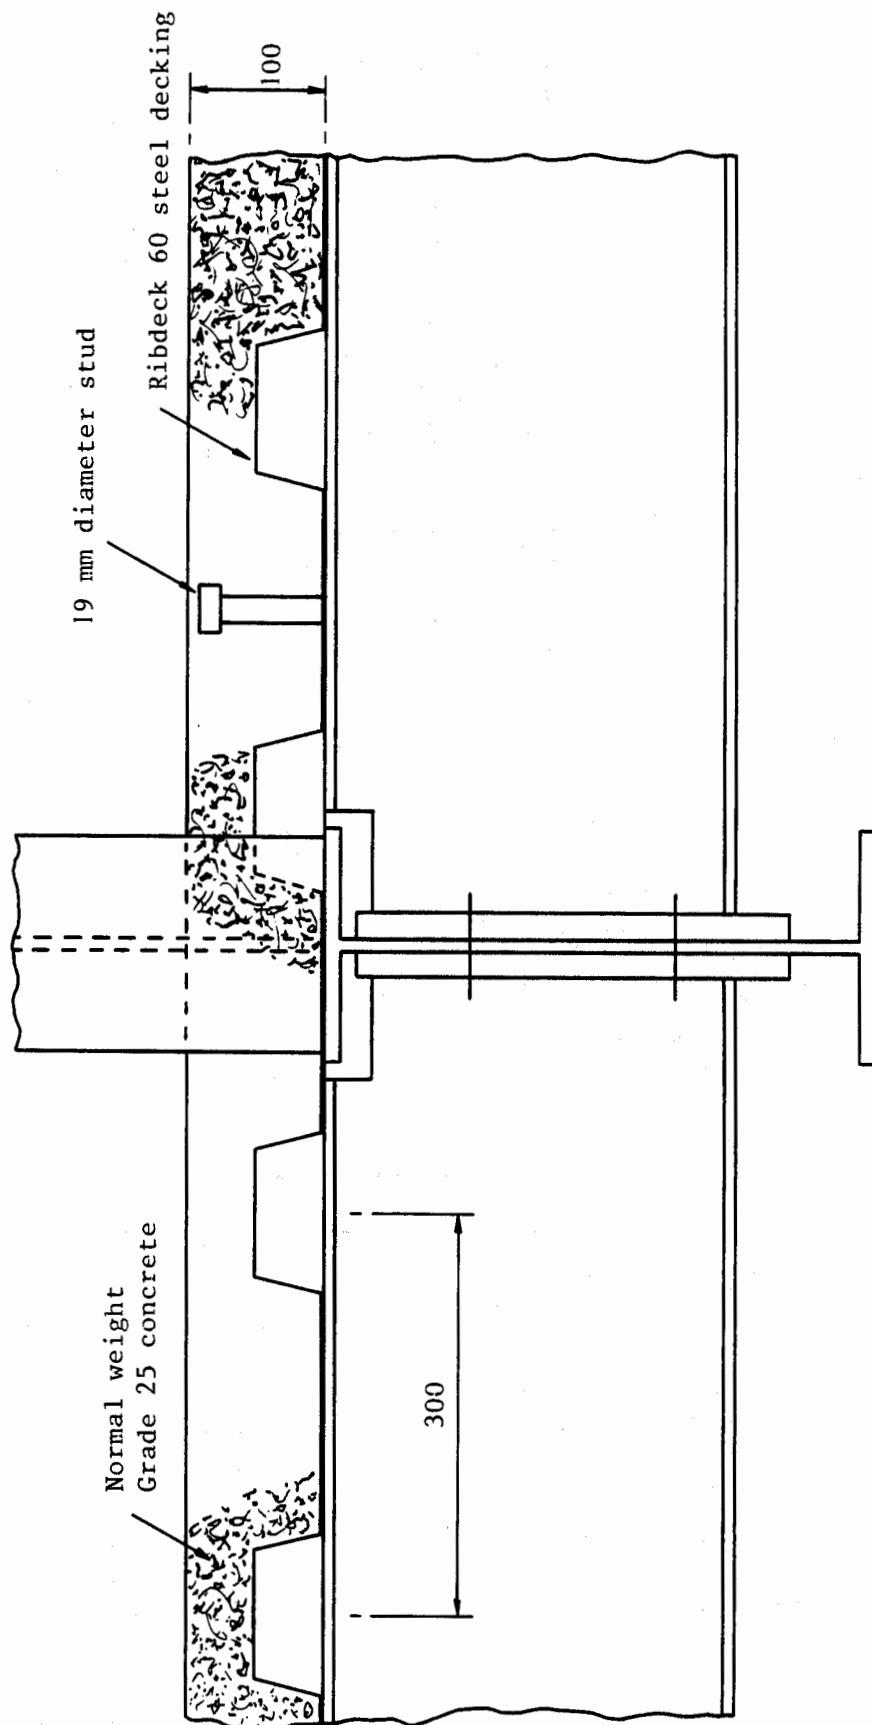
THERMOCOUPLE POSITIONS - ASSEMBLY NO. 9
